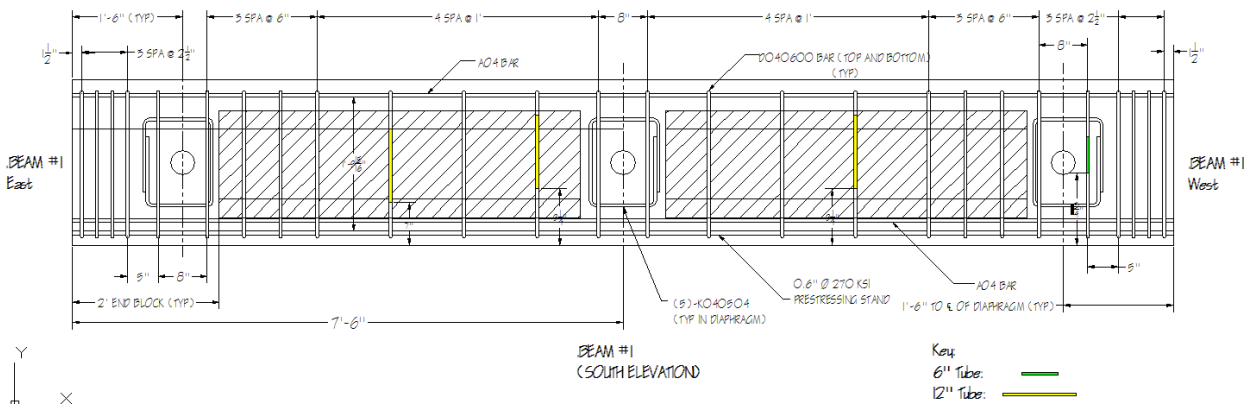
South Elevation of Box Beam 1 showing locations of defects around strands
